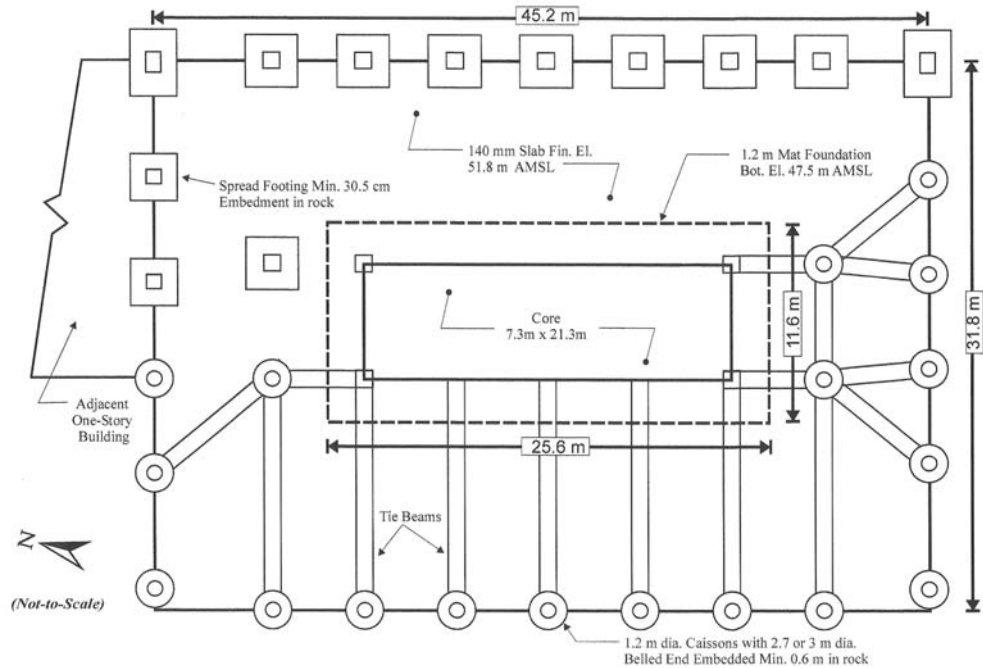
Walnut Creek building foundation plan (from construction drawings).
